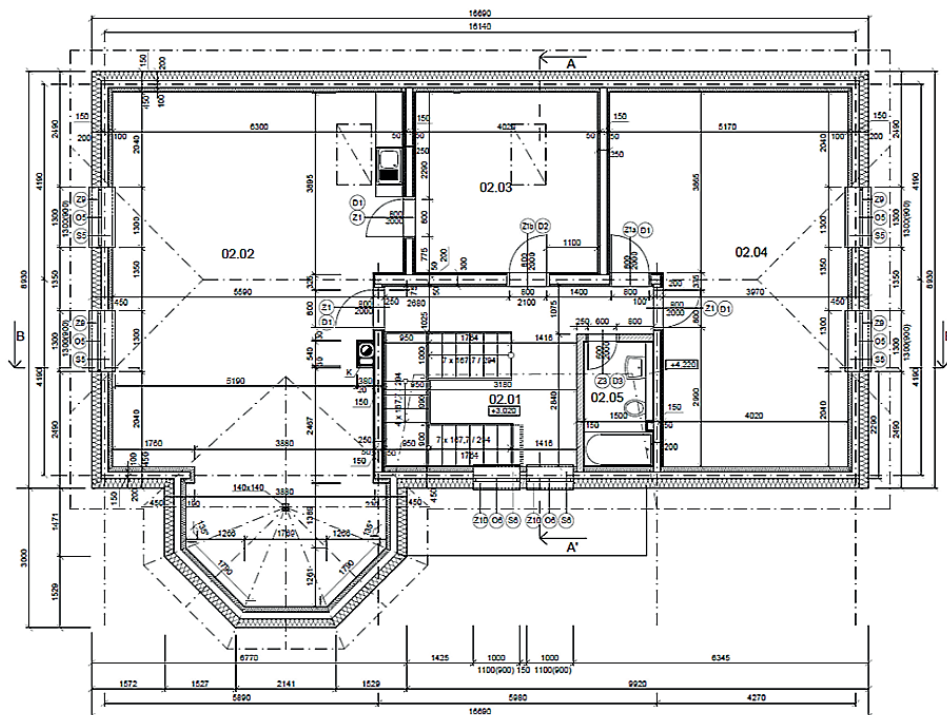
Prototype of prefabricated house IDA I. - floor plan of the second floor [2]
